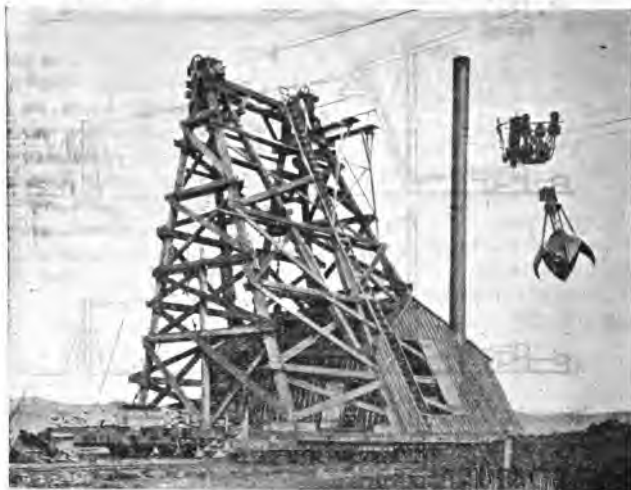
Lidgerwood Duplex Travelling Tower on Hennepin Canal. Height 57 ft. Forms Head Support for One Cableway; Tail Support for the Other; Cables, 18 ft., Center to Center.
